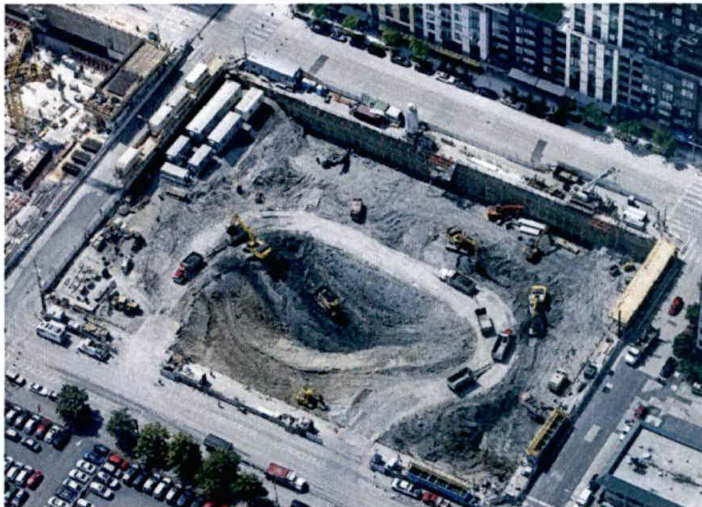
Block 19 on May 15, 2014 aerial photo with Blanchard Street to the right and Lenora Street on the left. Soldier piles being installed around the entire perimeter of the property and mass excavation beginning in the central portion of the project site.
